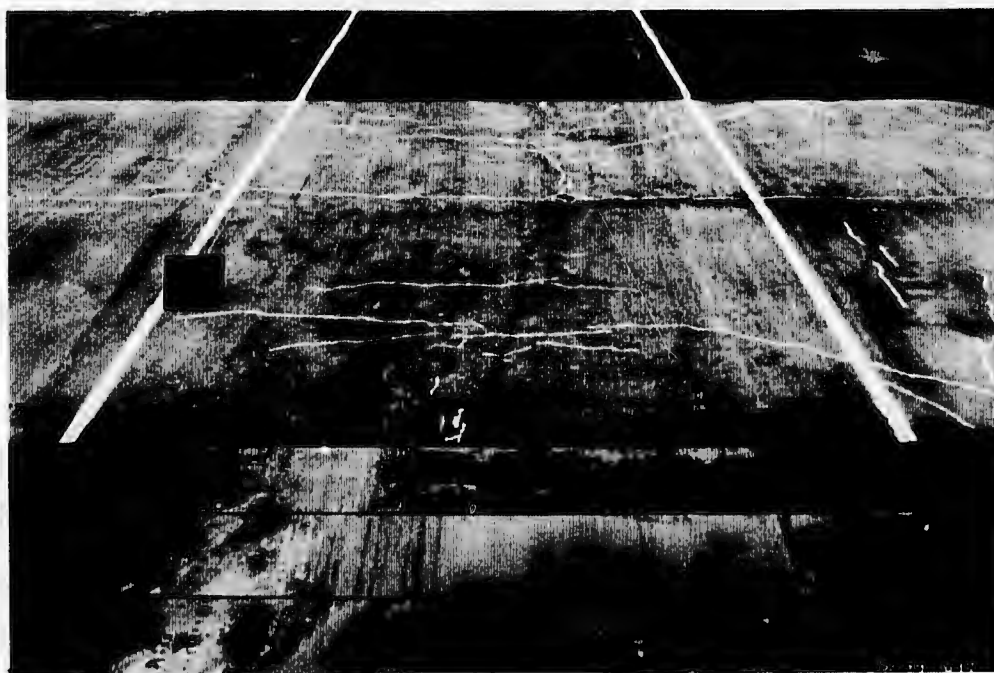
Item 5 after 4512 coverages of 360-kip, 12-wheel assembly
